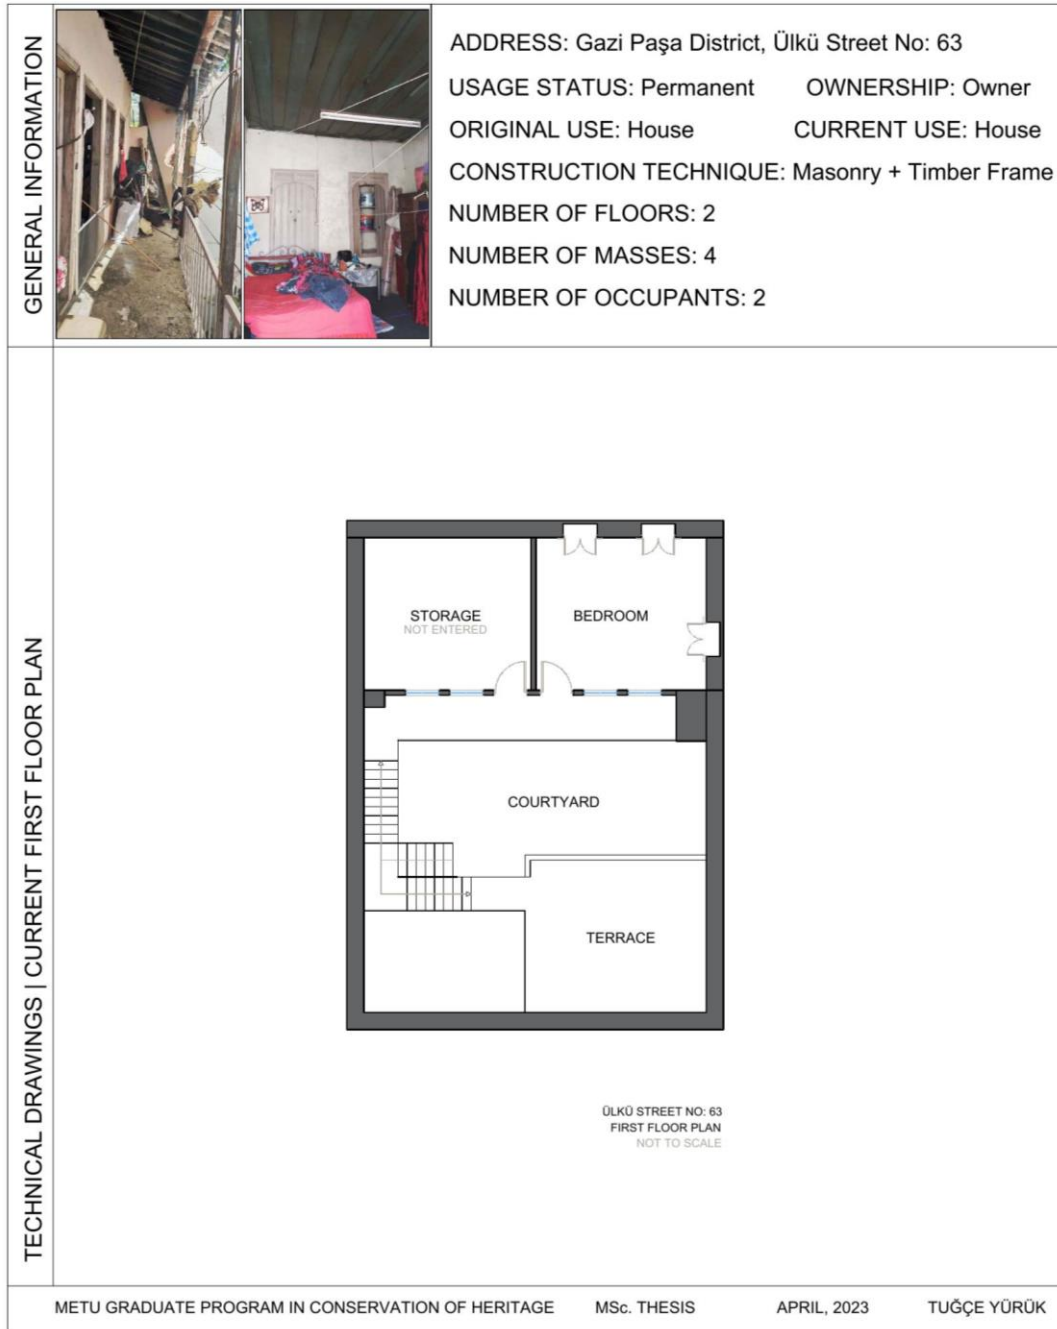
Current first floor plan of the Ülkü-63 House (Author, 2023)
